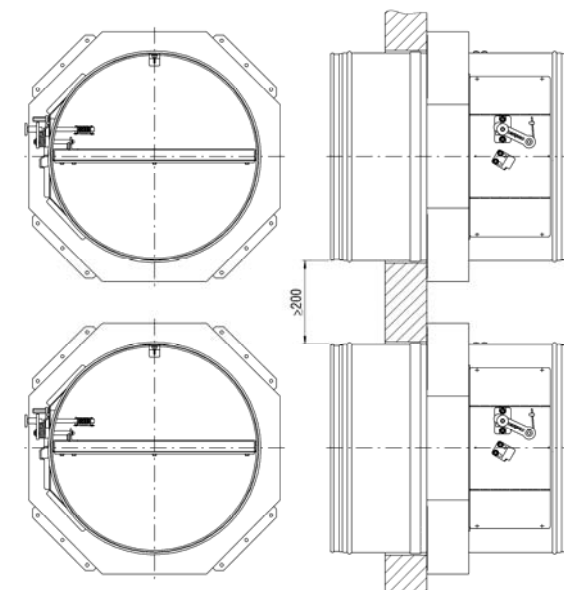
Dry installation on solid walls, BSK-RPR nominal size > 250 – minimum distance from one another
